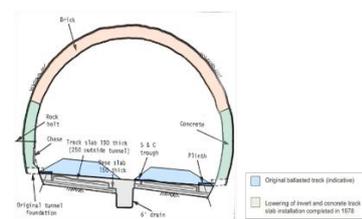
Typical cross section showing replacement of ballasted track in tunnels (Duncan 1980).
